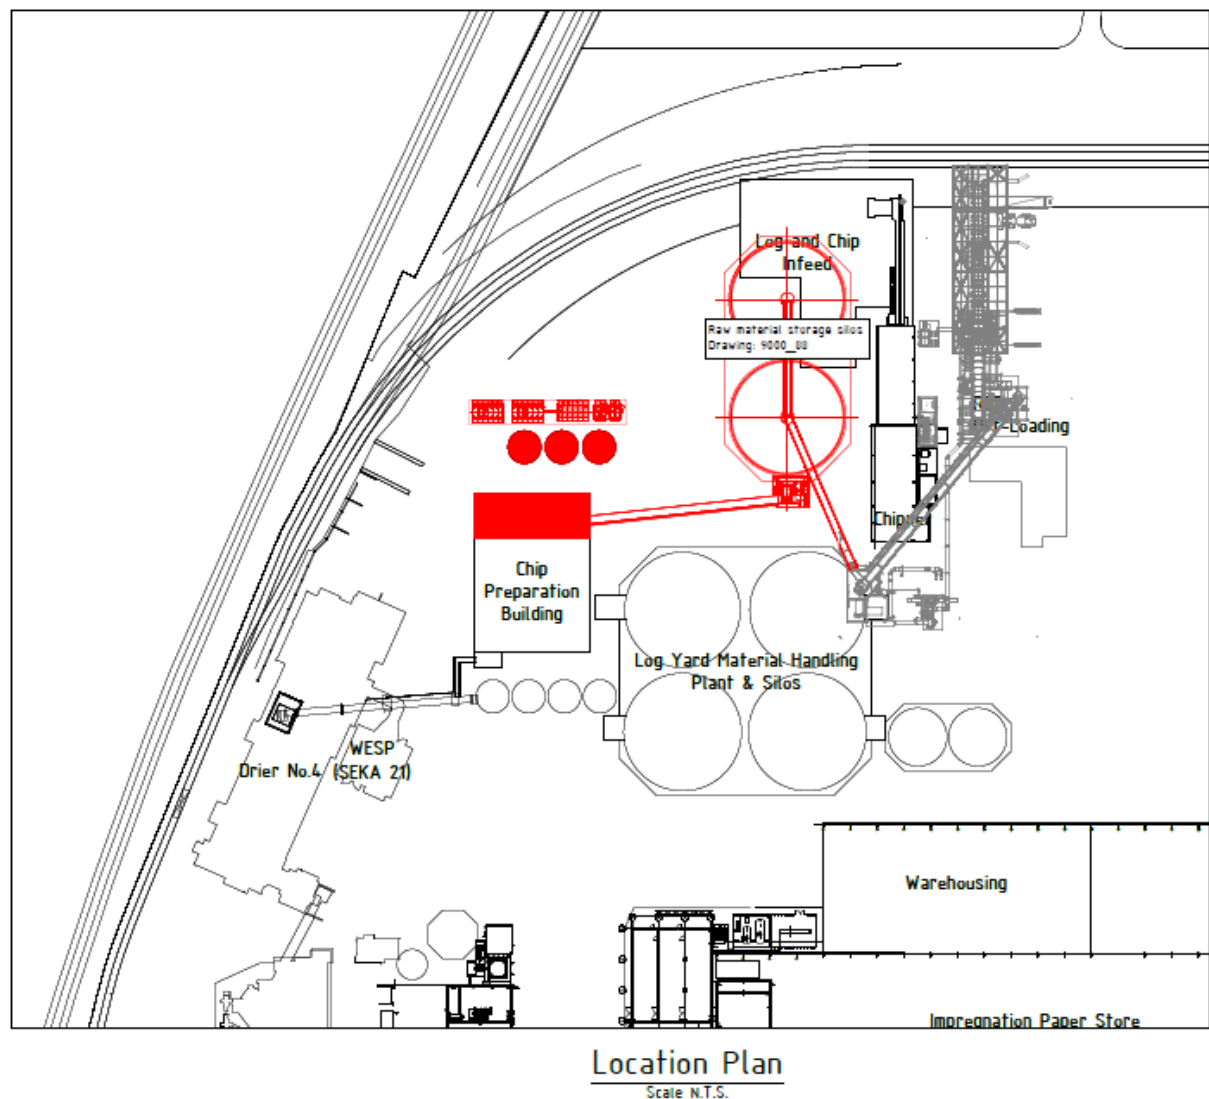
Layout of Wood Chip Prep Building Extension & Additional Silos
